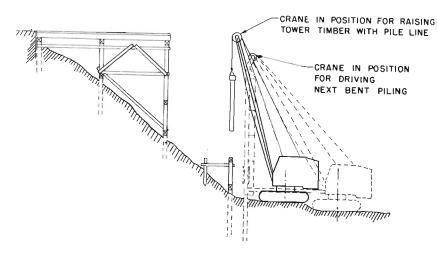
Crawler-mounted crane operating from ground to drive piles and erect timber towers,
